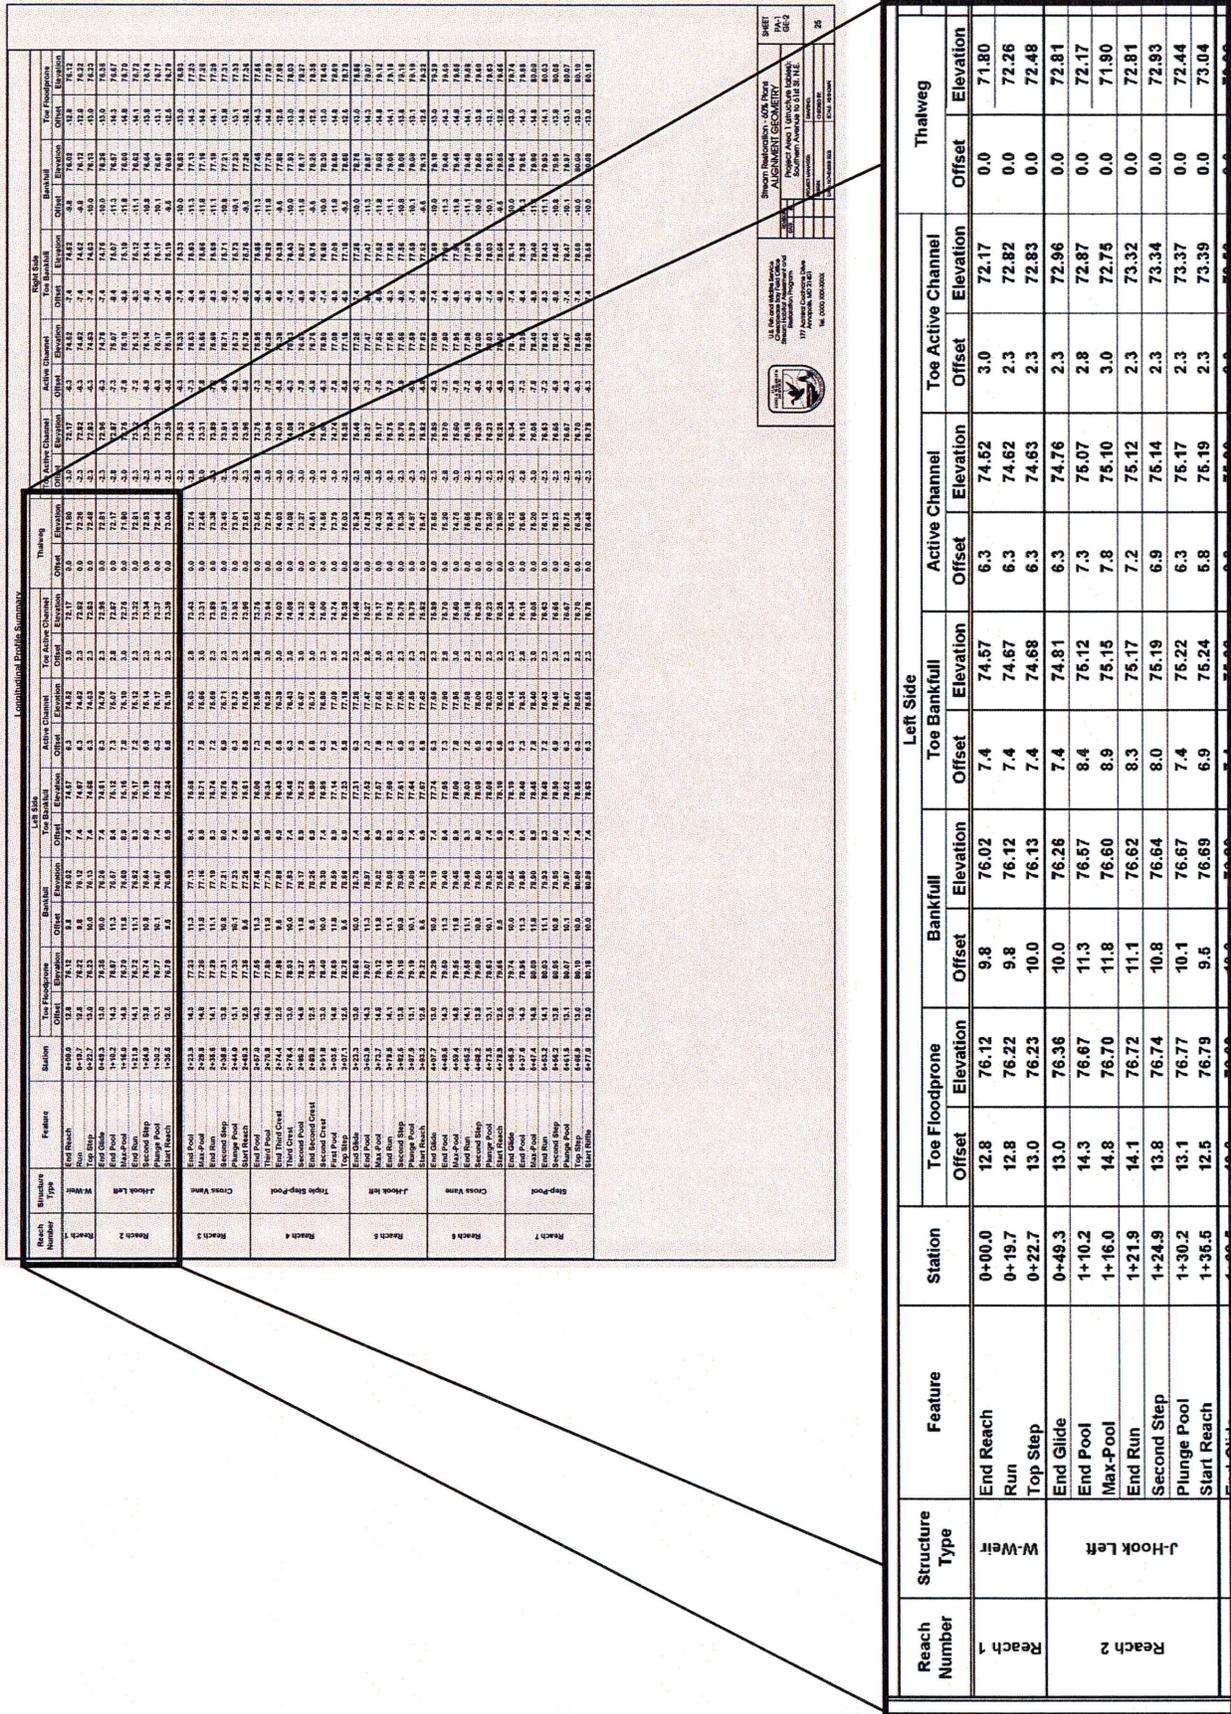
Example of longitudinal profile summary table with enlargement of relevant cross section channel elevations
